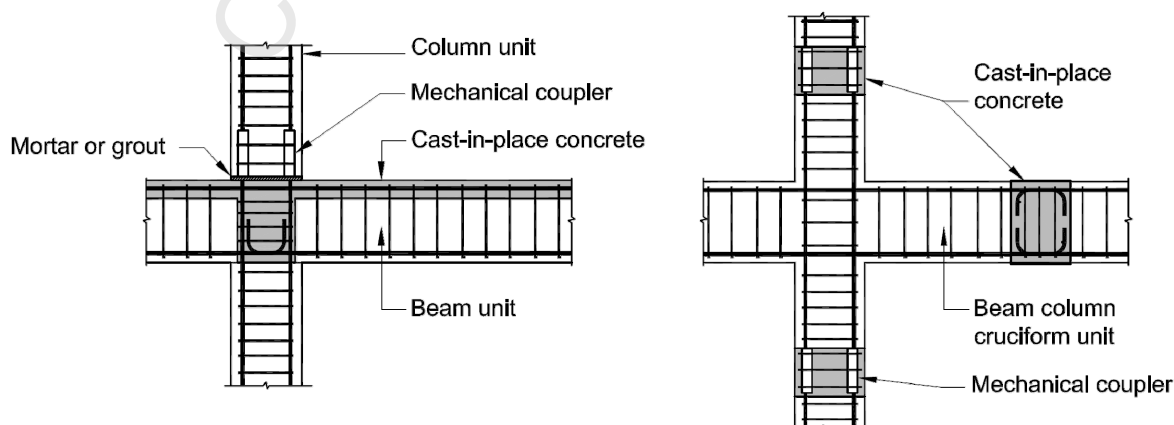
Typical equivalent monolithic arrangements of precast reinforced concrete units and cast-in-place concrete<sup>B.1, B.2</sup>
